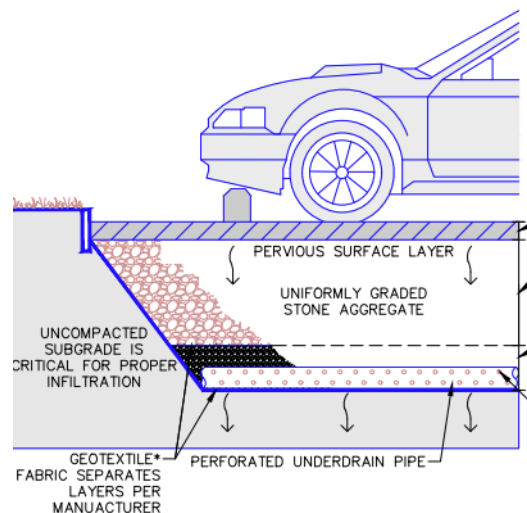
Detail for a typical pervious pavement installation. See the Greenville County Design Manual Appendix G for more specifications.
